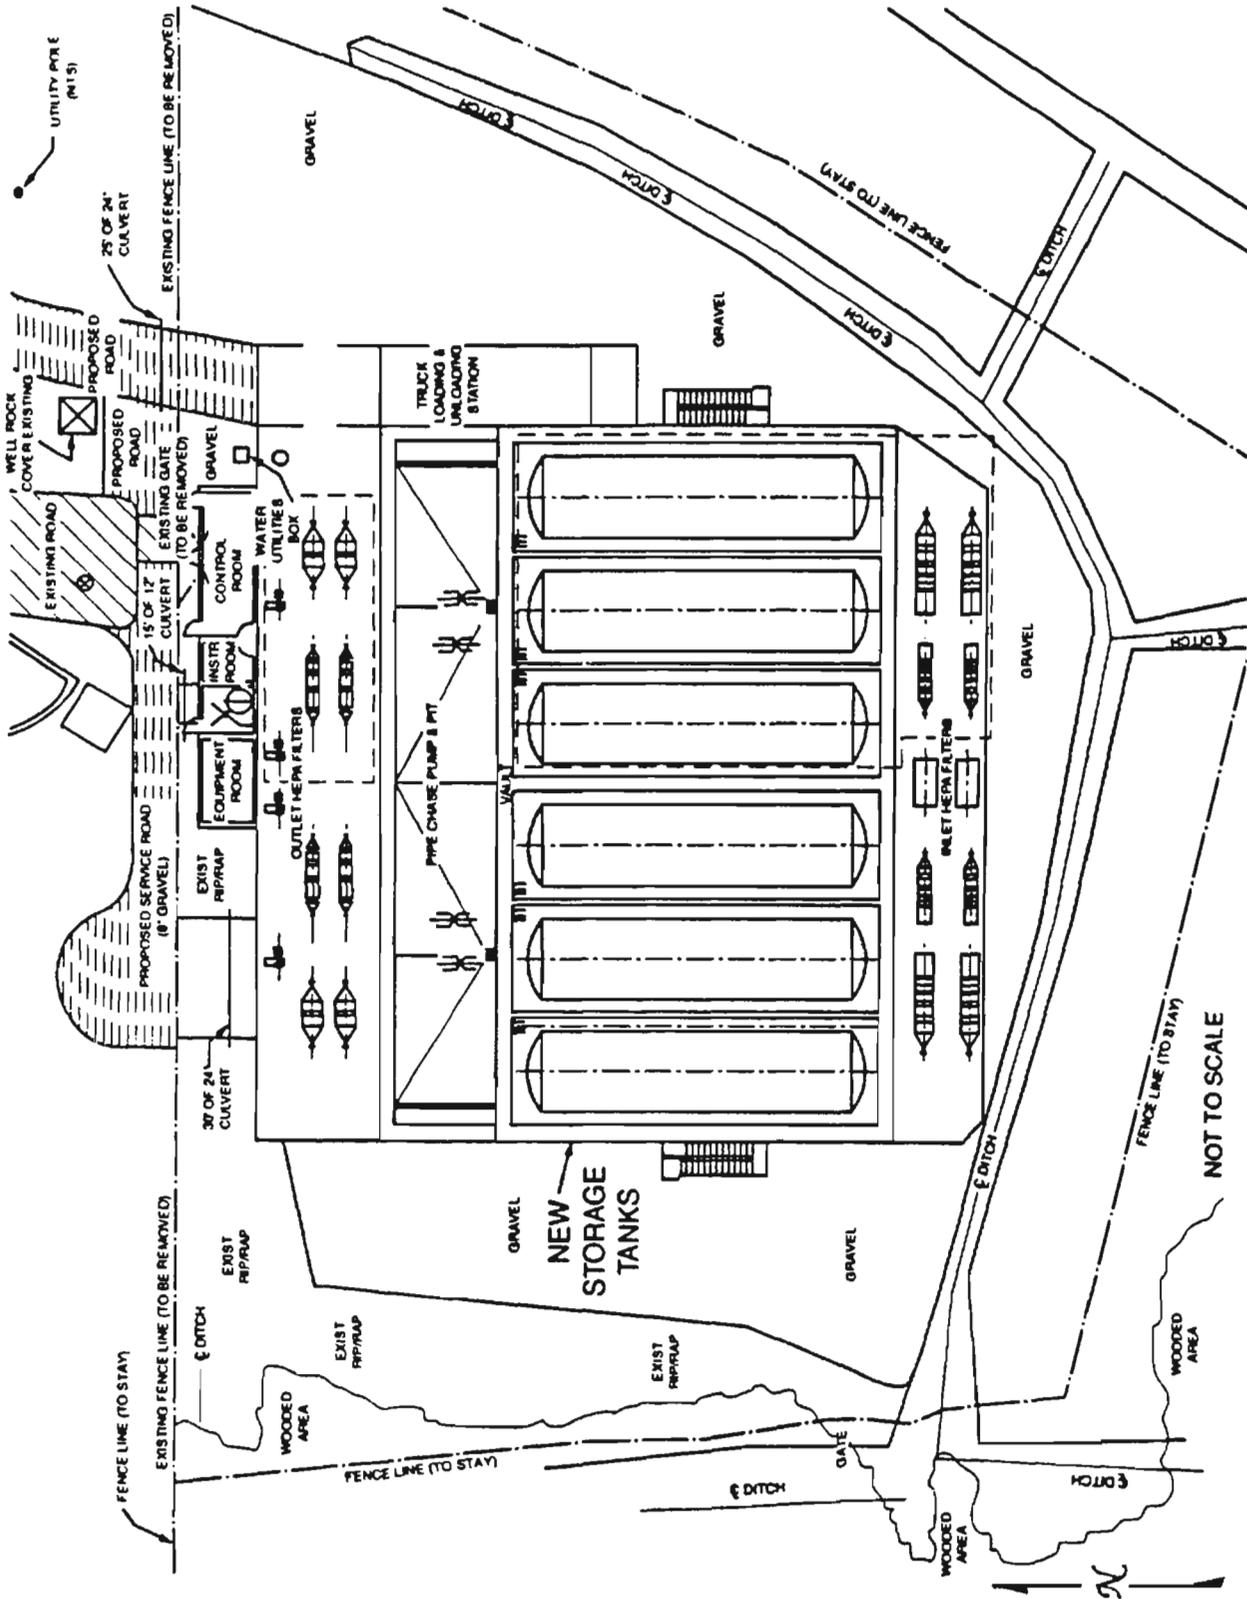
Proposed site of the Melton Valley Storage Tank Capacity Increase Project storage tank facility.
